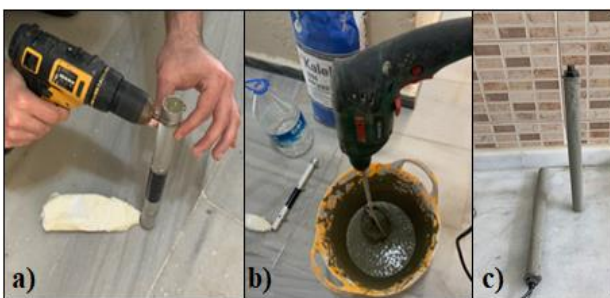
Model pile foundation; a) placing the concrete in the aluminum mold b) concrete preparation for production of model pile, c) model piles
